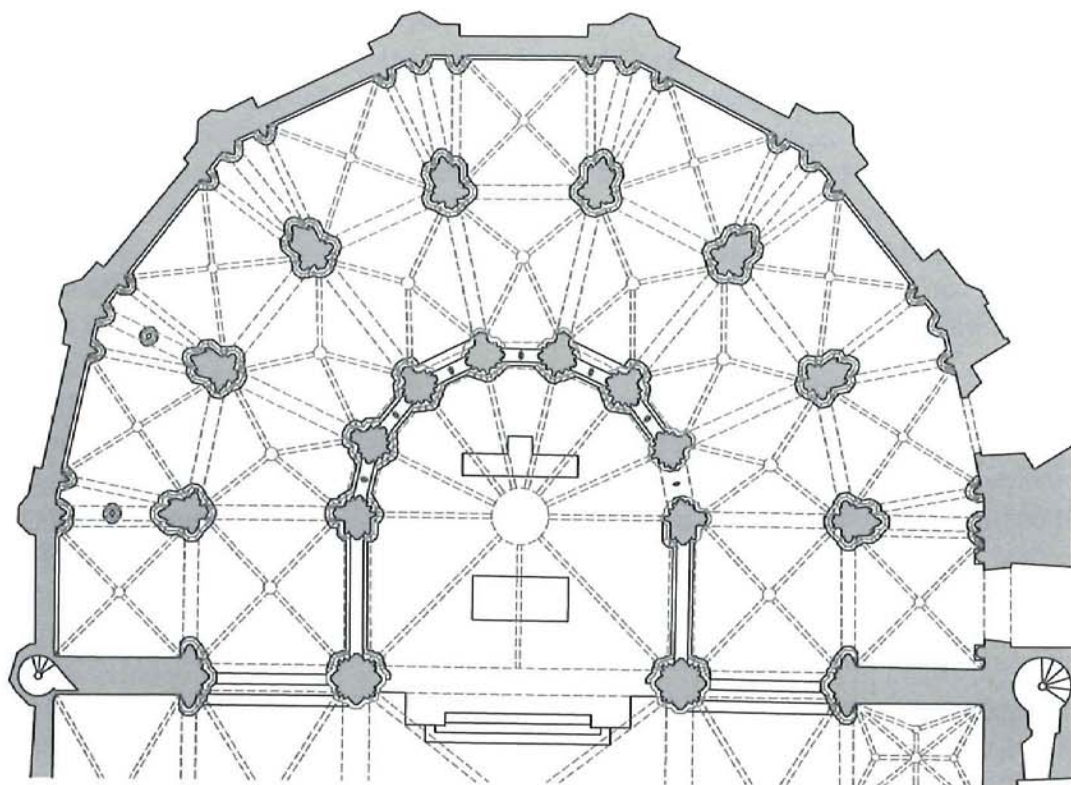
Plan of the apse, Santa Maria Cathedral, Tortosa.
